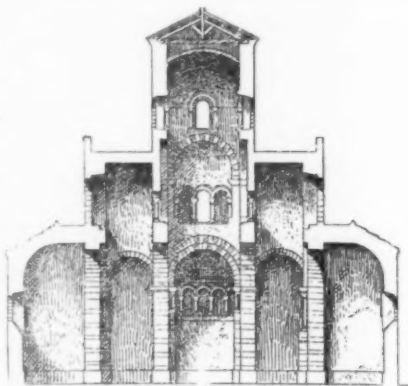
Transverse Section of the Church of Germigny-les-Prés.
